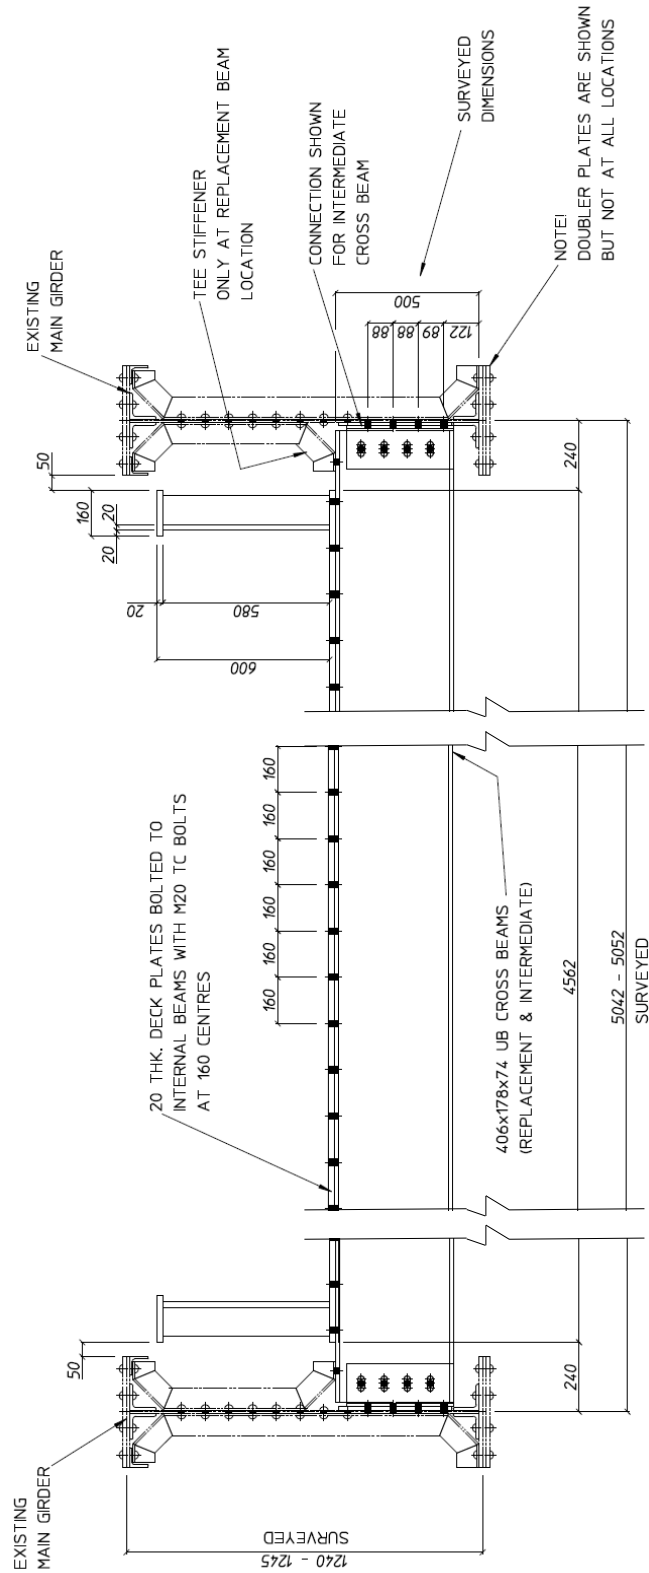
Bridge cross section (units in millimetres) (WSR).
